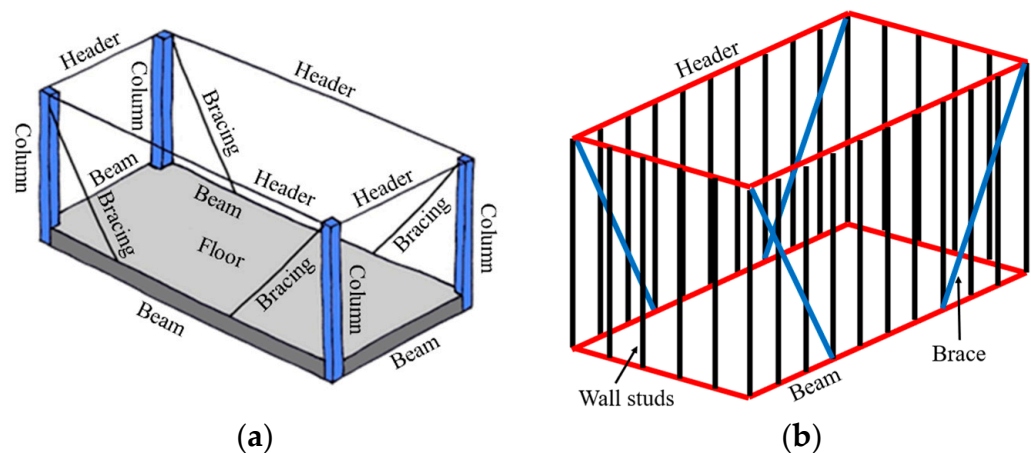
Isometric view of a typical (a) corner-supported and (b) wall-bearing modules.
